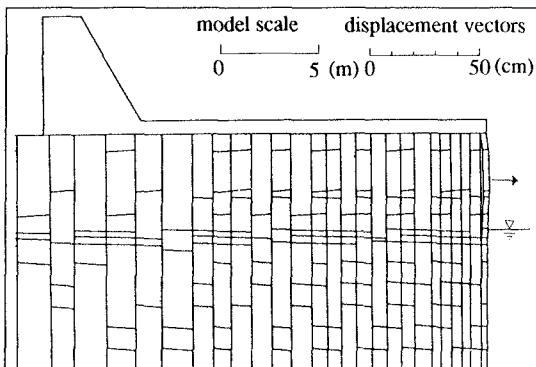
Deformational behavior of steep slope caused by heavy flood.
